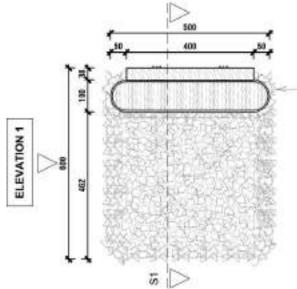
PLAN PLEASE REFER TO TECHNICAL SHEETS FOR SCALED DRAWINGS DETAIL 3-3 ELEVATION 1 PLEASE REFER TO TECHNICAL SHEETS FOR SCALED DRAWINGS
